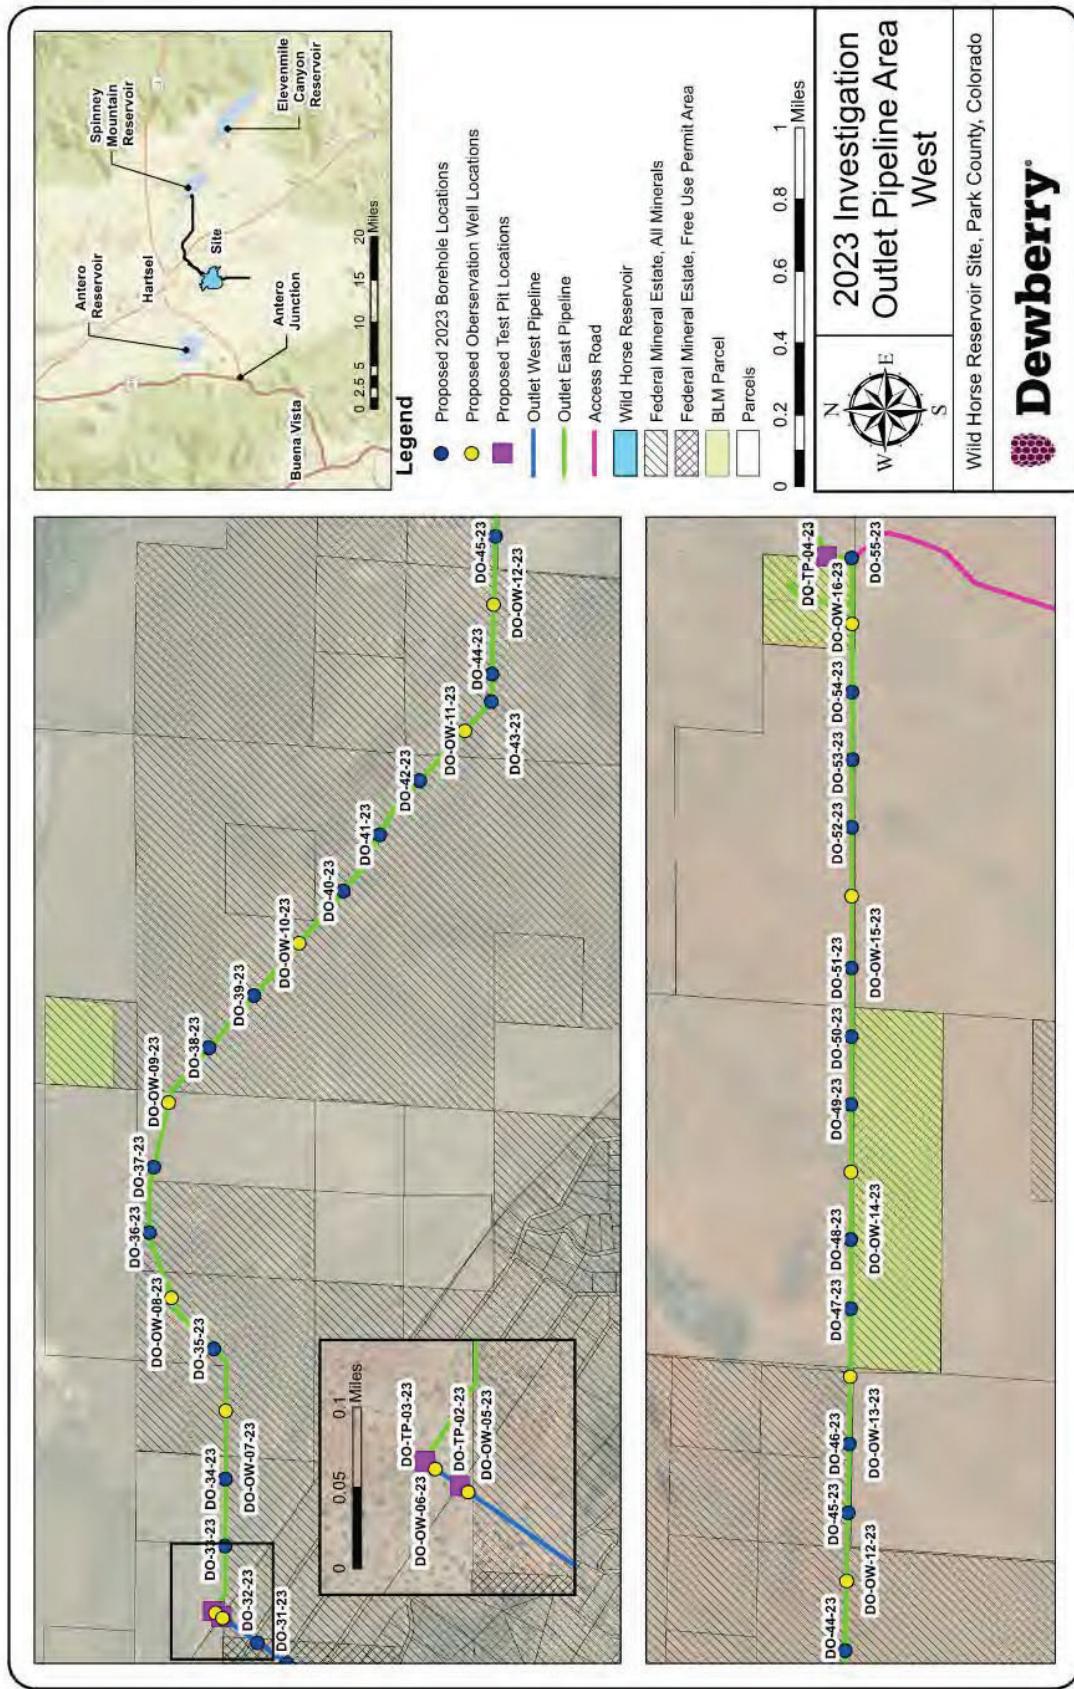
Proposed field investigation plan view of Outlet Pipeline west area
